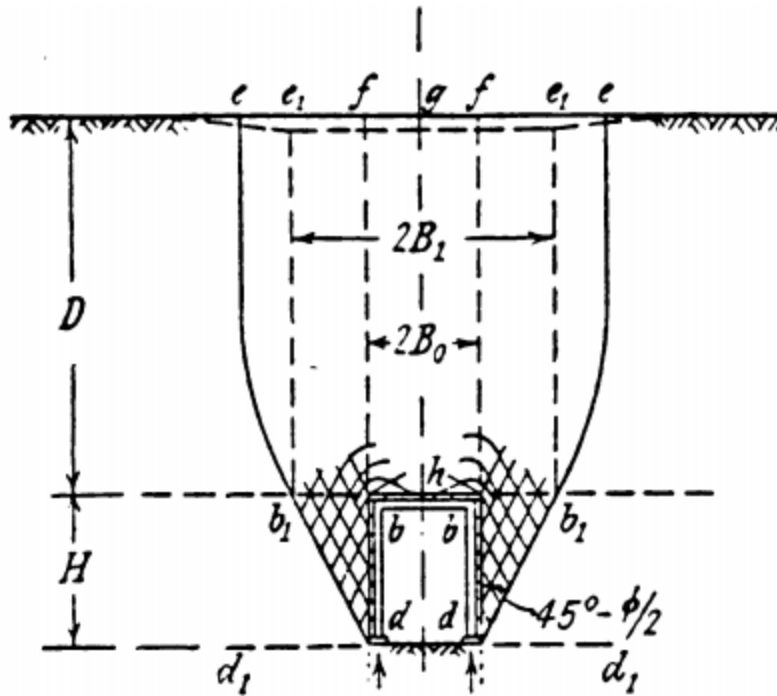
Flow of Soil toward Shallow Tunnel When Yielding Happened in the Soil (Terzaghi, 1943)
